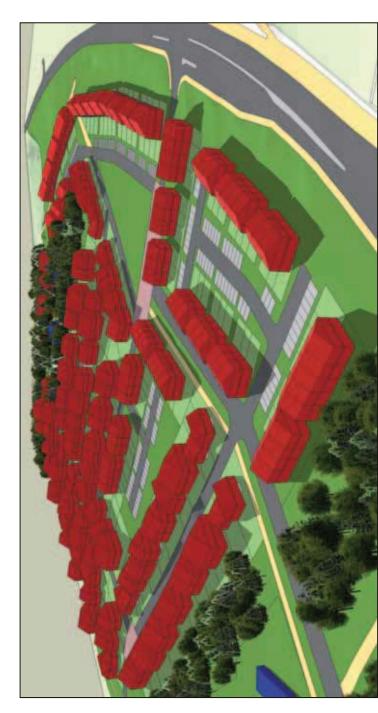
Area B viewed from the Lang Stracht, looking south west.
